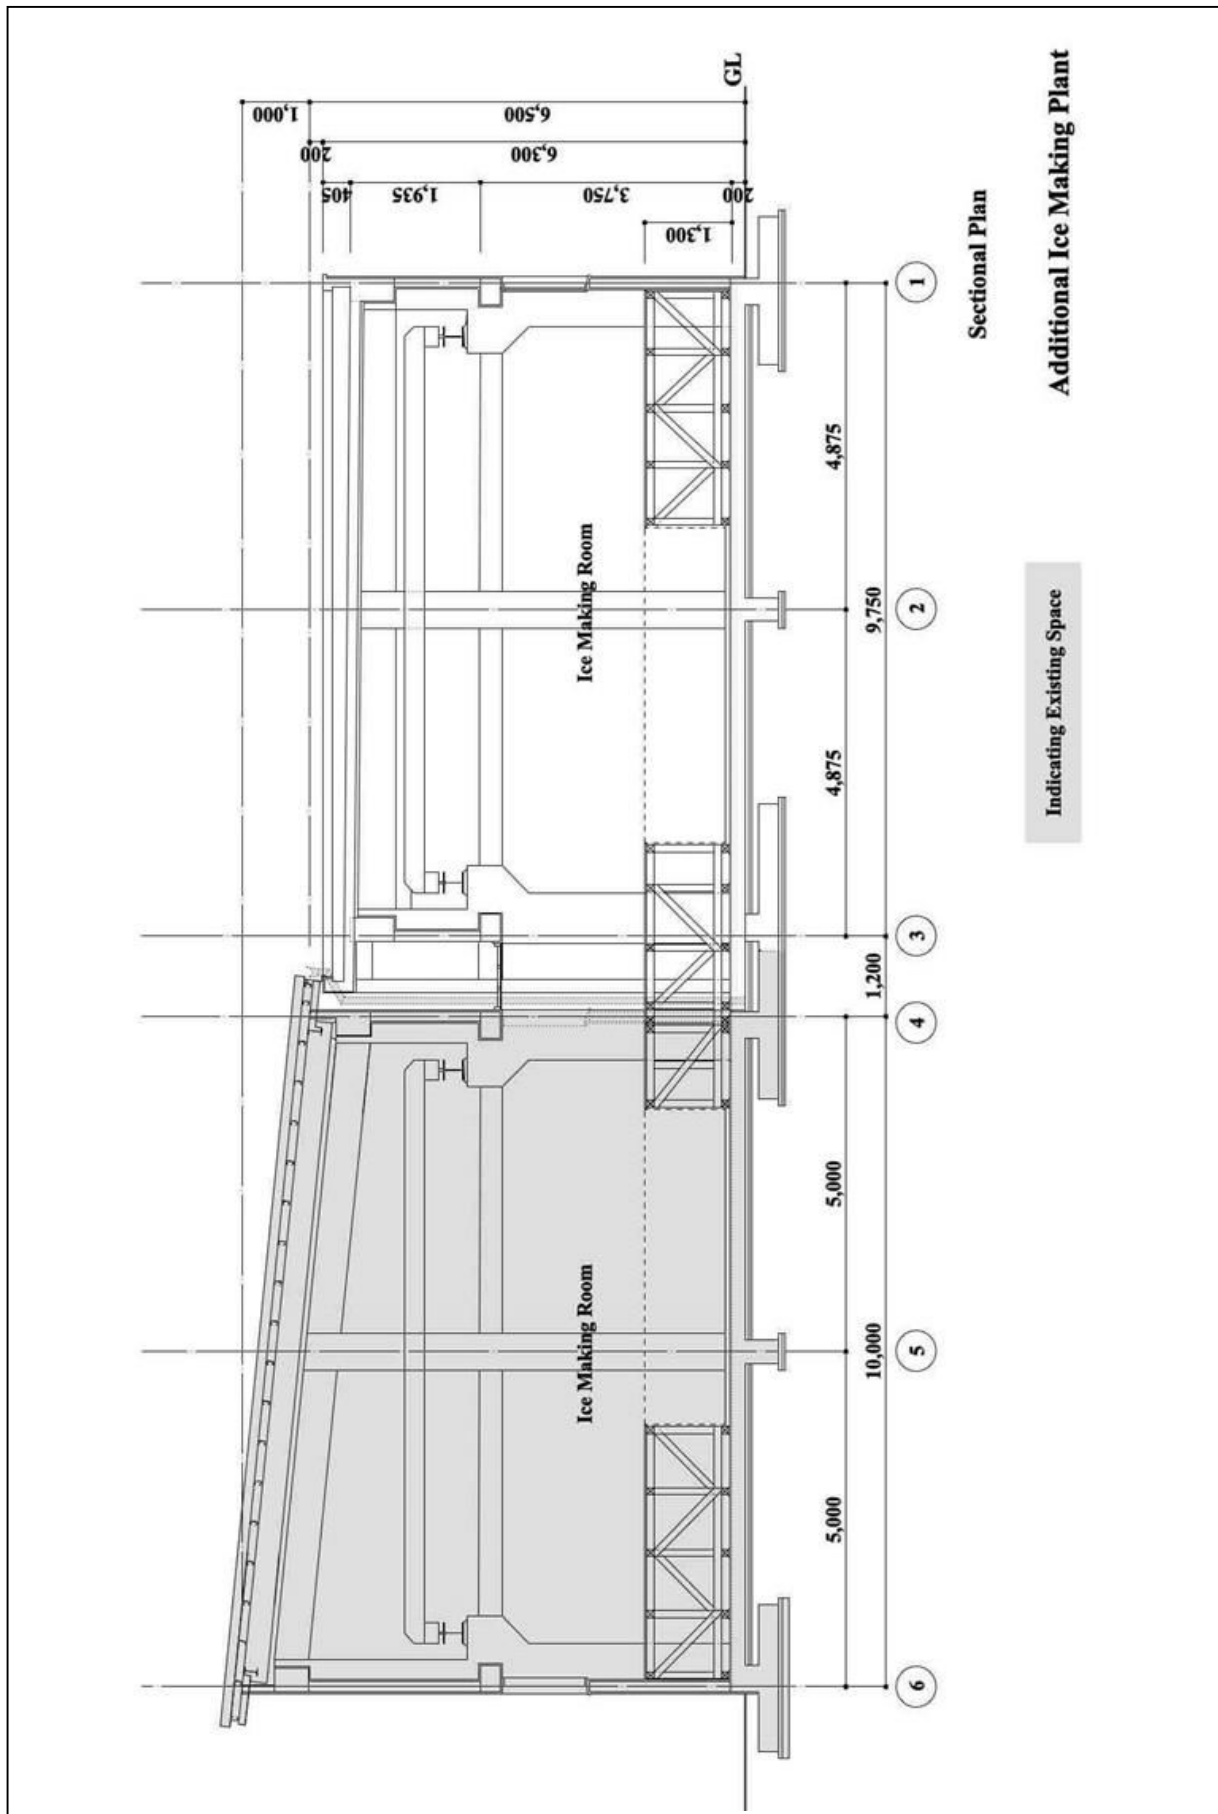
(8) Sectional Plan and Elevation of Ice Plant
